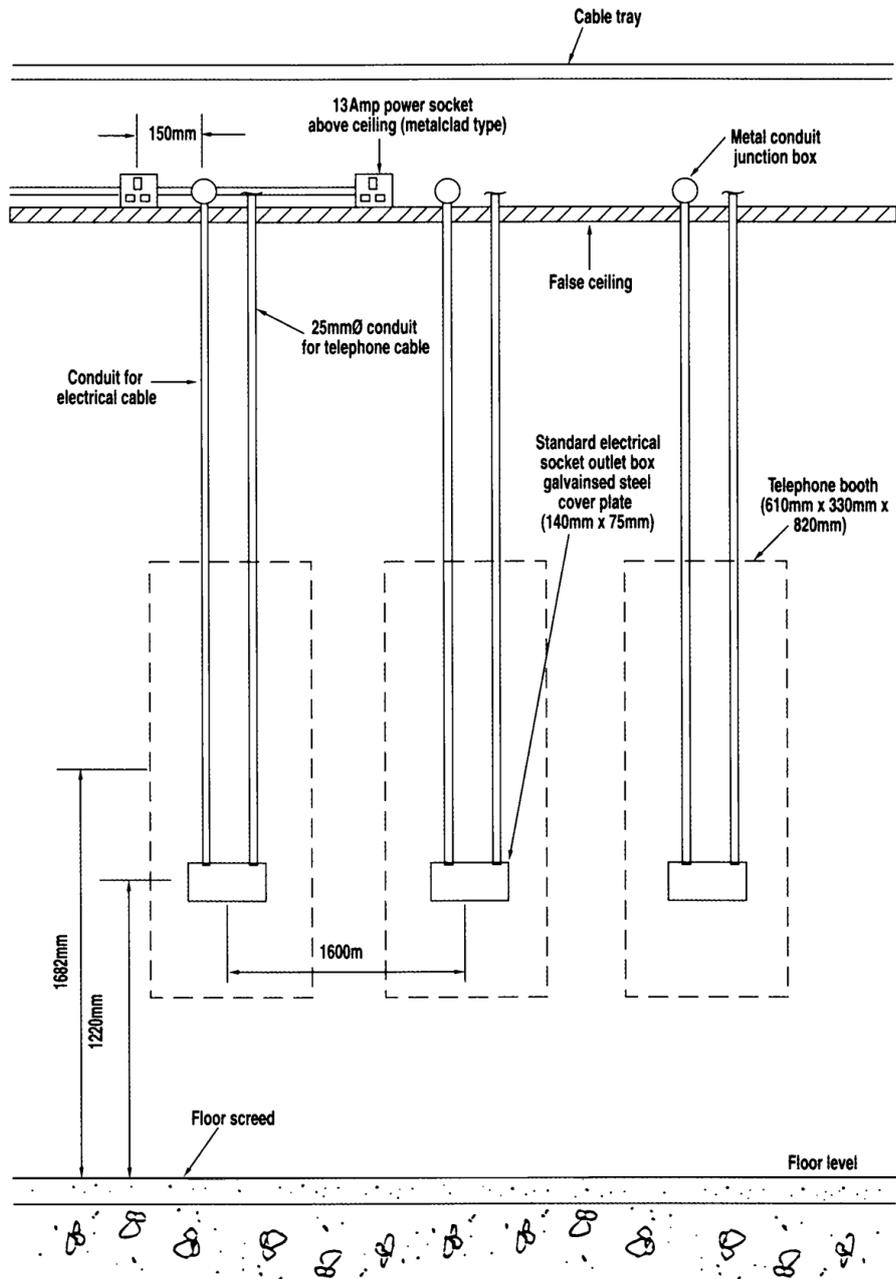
TYPICAL CONDUIT FOR WALL
